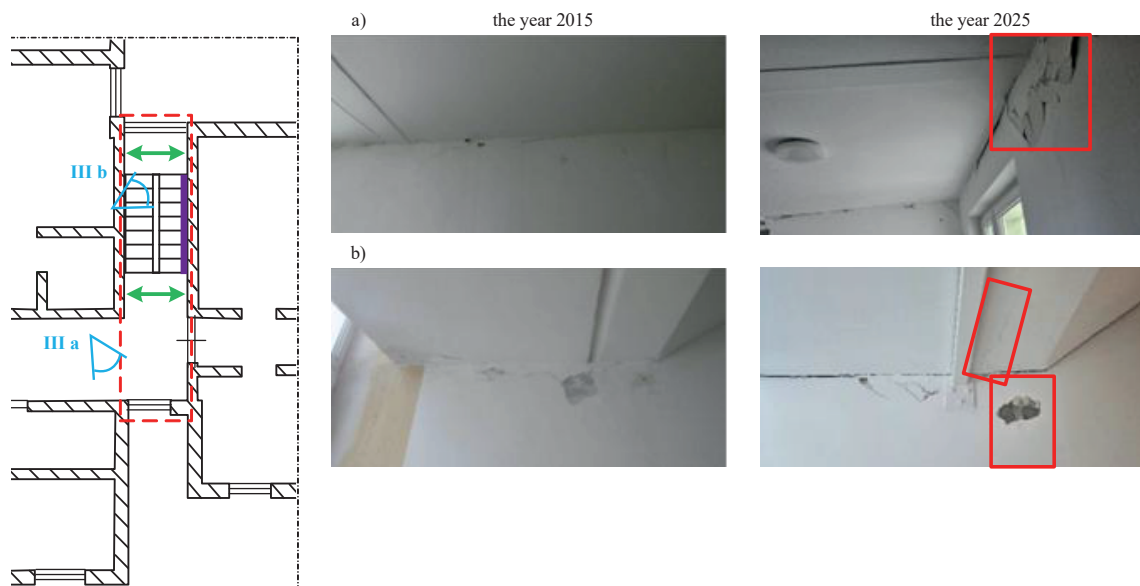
Extent of damage on the penultimate floor in 2015 [16] and currently, a) under the ceiling of the shorter part of the building, next to the staircase, b) at the landing support, as of August 2025
